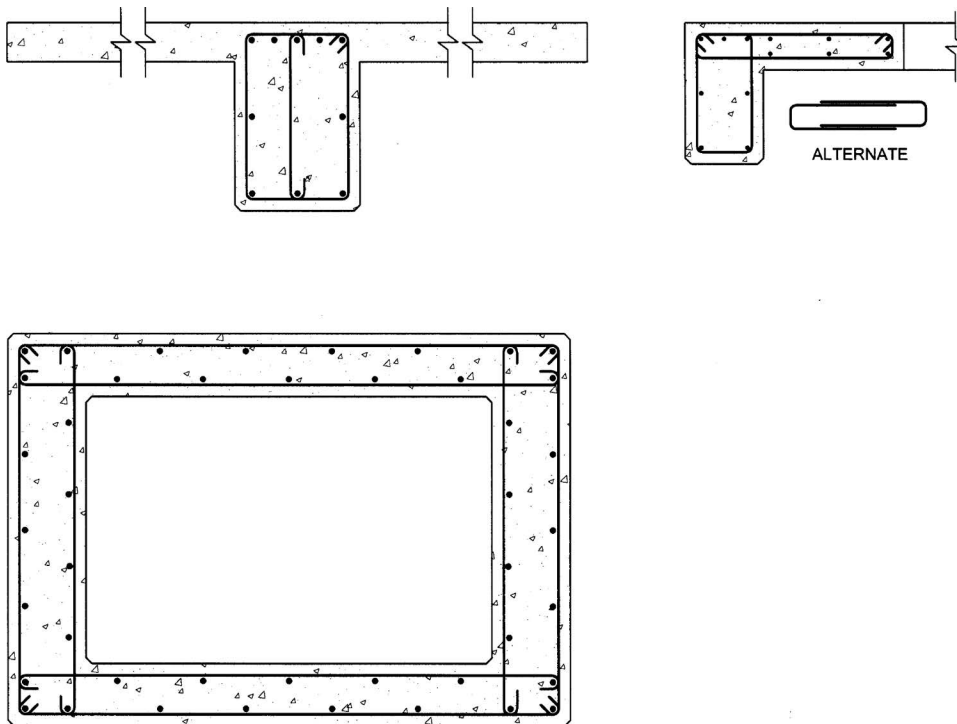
Examples of transverse torsional detailing in cast-in-place concrete members.
